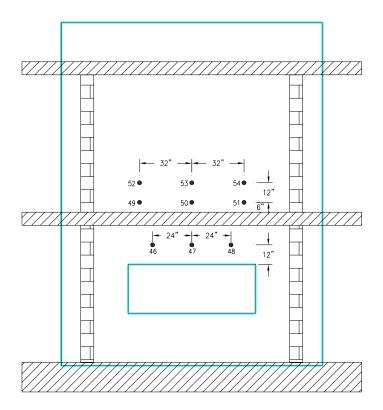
Instrumentation Arrangement (Interior Face of Wall Assembly on Second-Floor Room and Burn Room).
